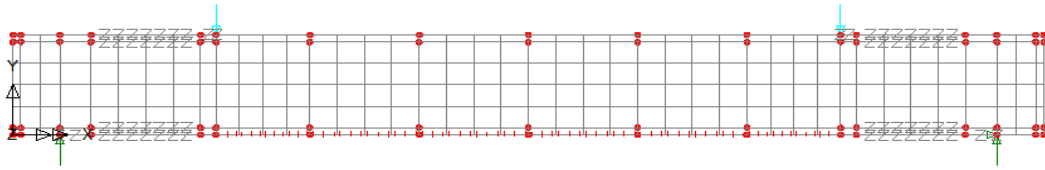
Crack Model in concrete beams with GFRP retrofit continuously mounted on a shear beam span (BGPF) when load $P_{\text{crack}} = 14,390$ kN
